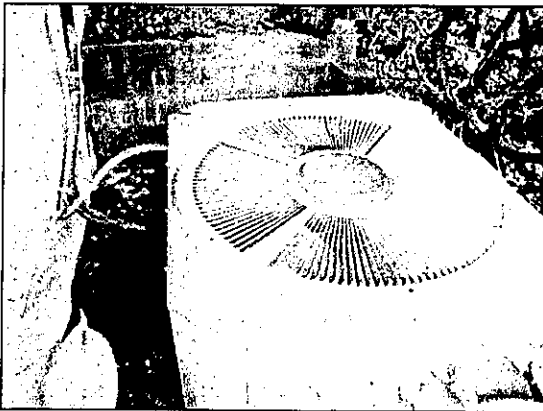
HVAC outdoor unit is installed in an area that may obstruct proper air flow.
